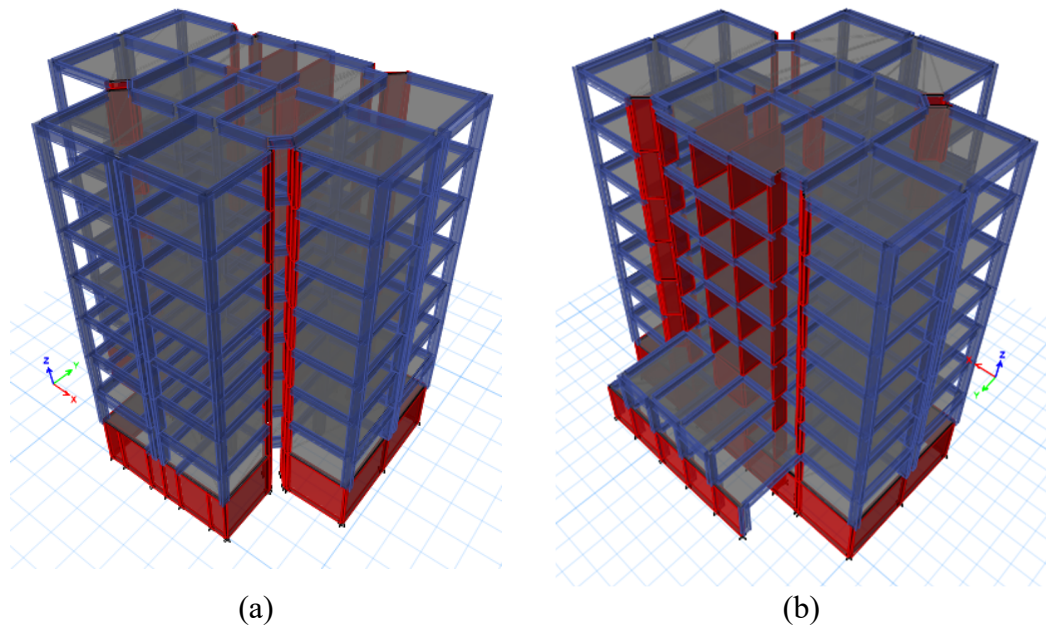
3-D views of the finite element model of the as-built building from (a) SE and (b) NW corners.
